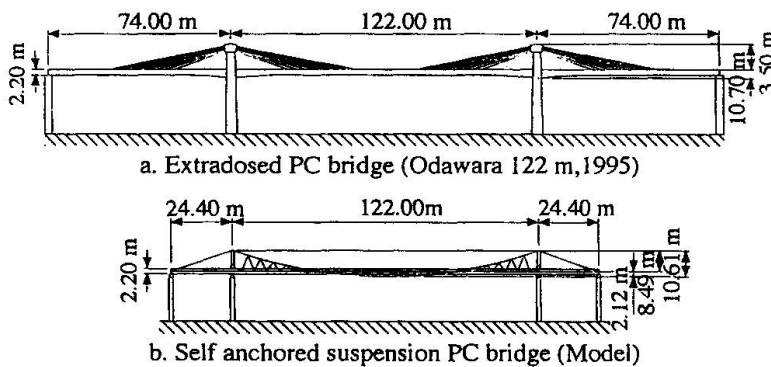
Prestressed concrete (PC) bridges with tendons of large eccentricity
